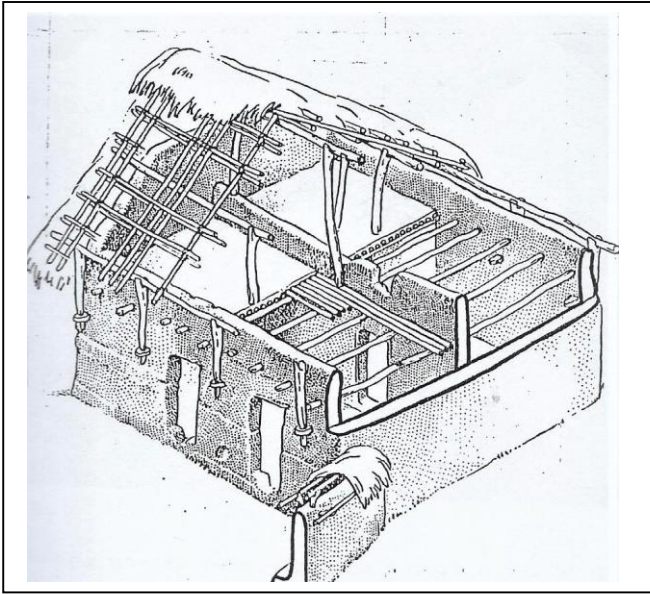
The roof from inside of room Fig: 9 Roofing (Source: Schreckenbach, 1986)
